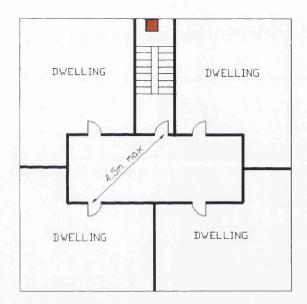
Small single stair building with maximum travel distance of 4.5m.
